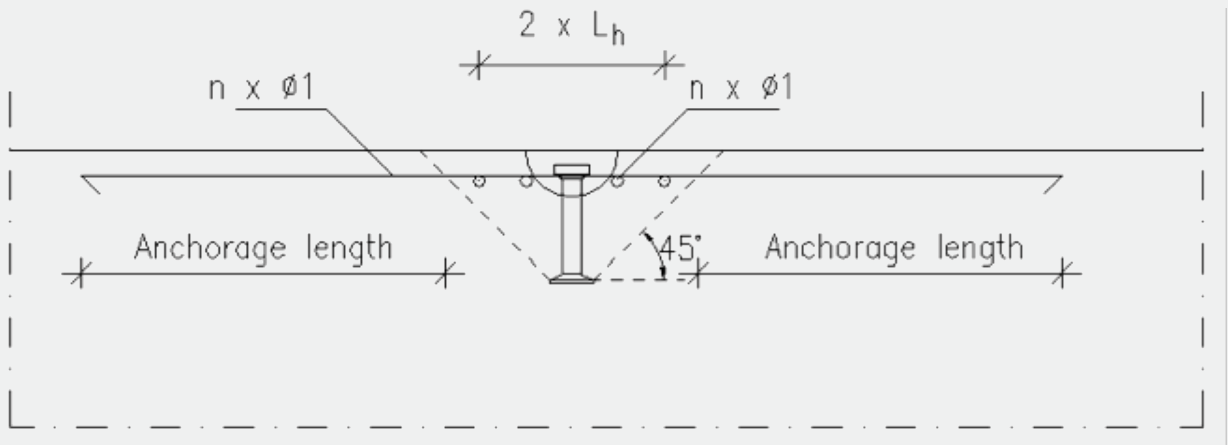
| Anchoring reinforcement in slab (see table 6)
